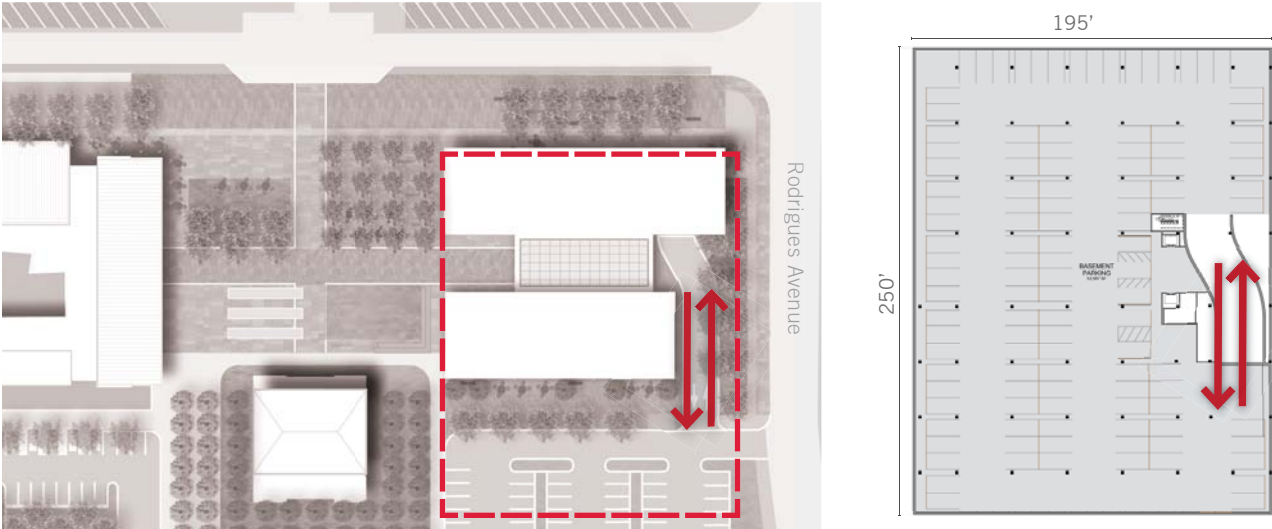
Location and conceptual layout of underground parking below New City Hall
